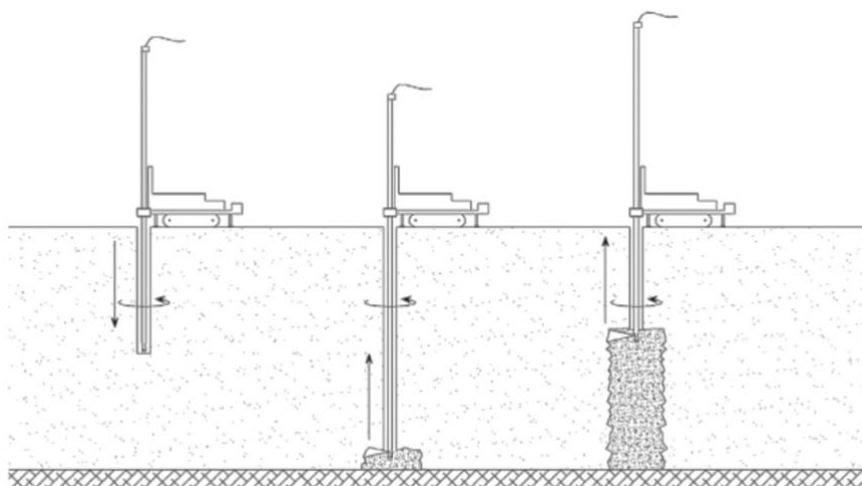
The stages of jet grouting; drilling, jetting and grouting of columns (Croce et al. 2014).
